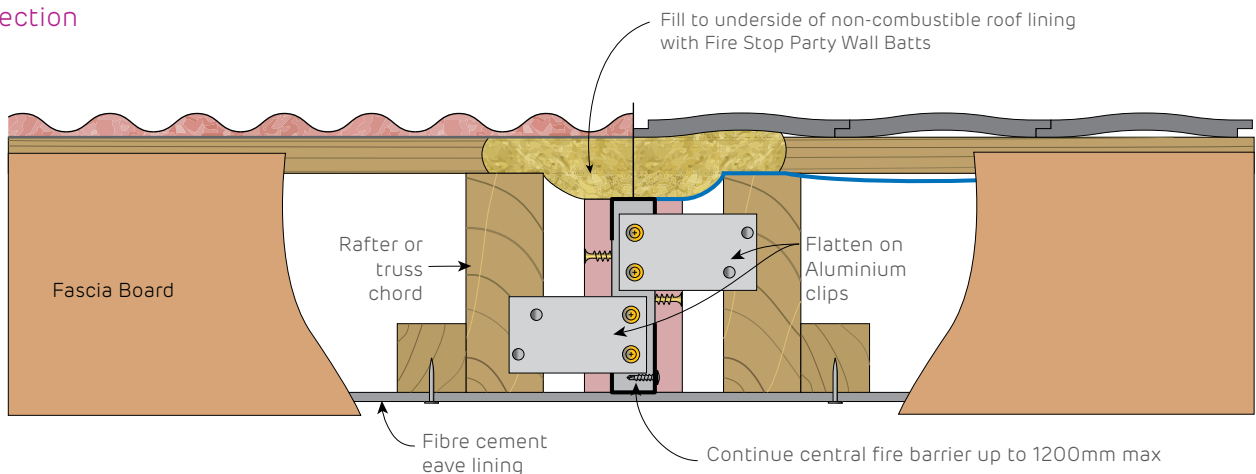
Interhome over Eave End Detail for Class 2 Buildings
